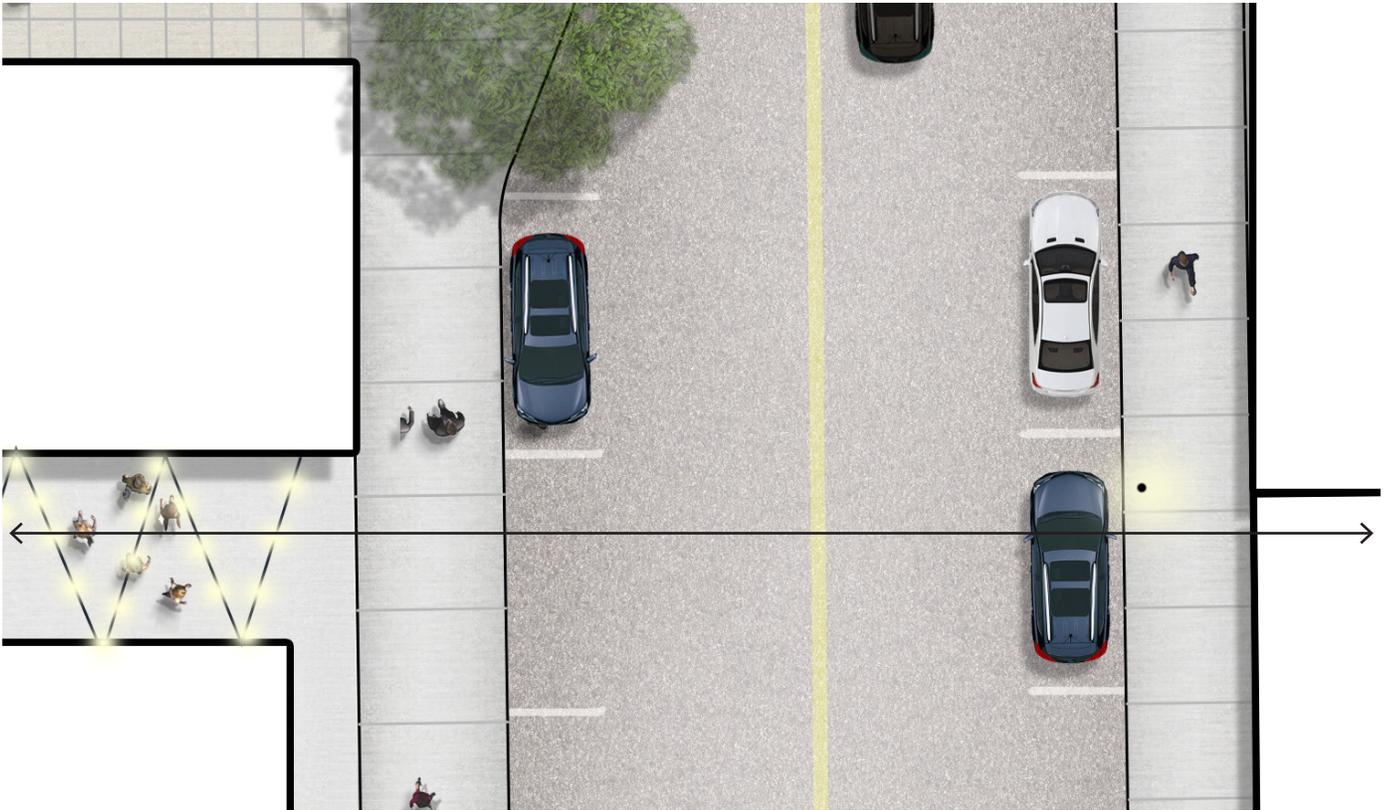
Section 2: Typical Road Cross Section Parking on Both Sides
